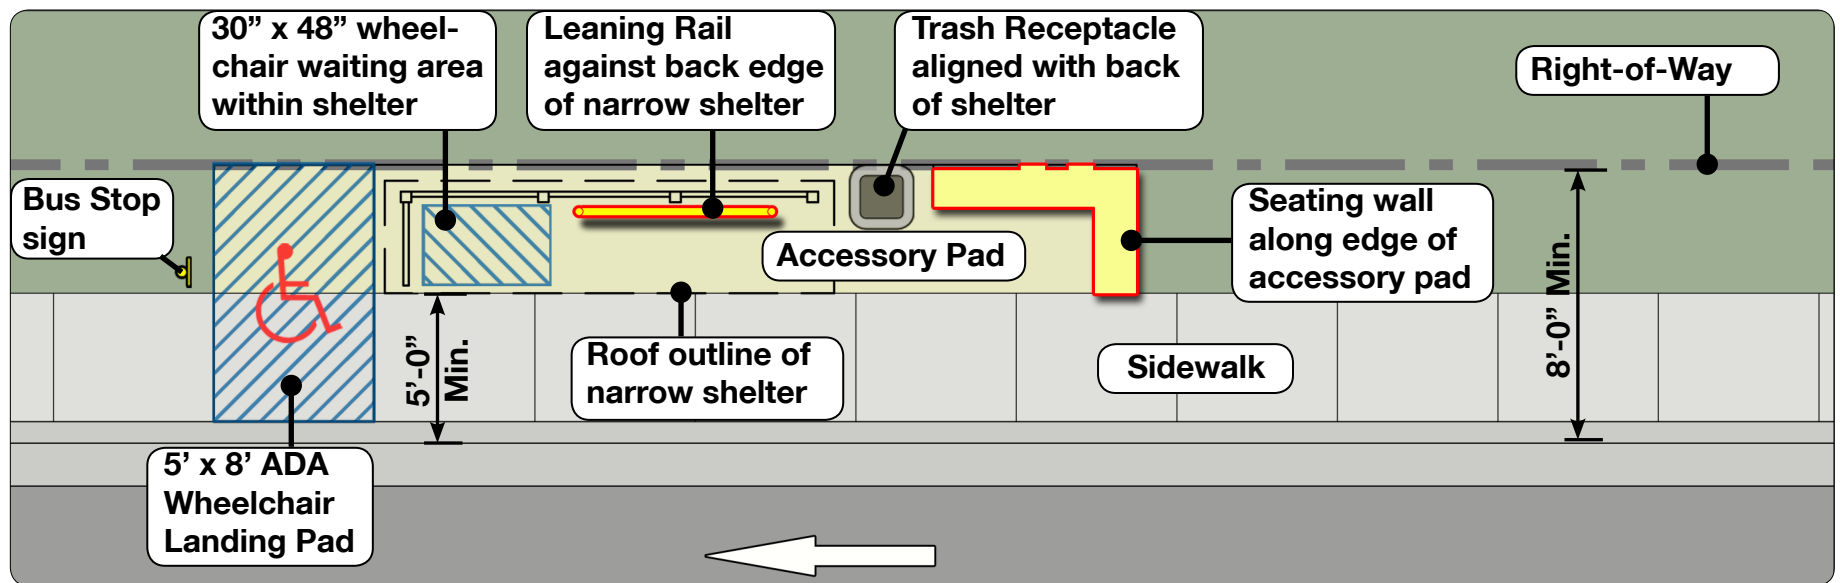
Layout of Leaning Rail in Narrow Shelter and Seating Wall
